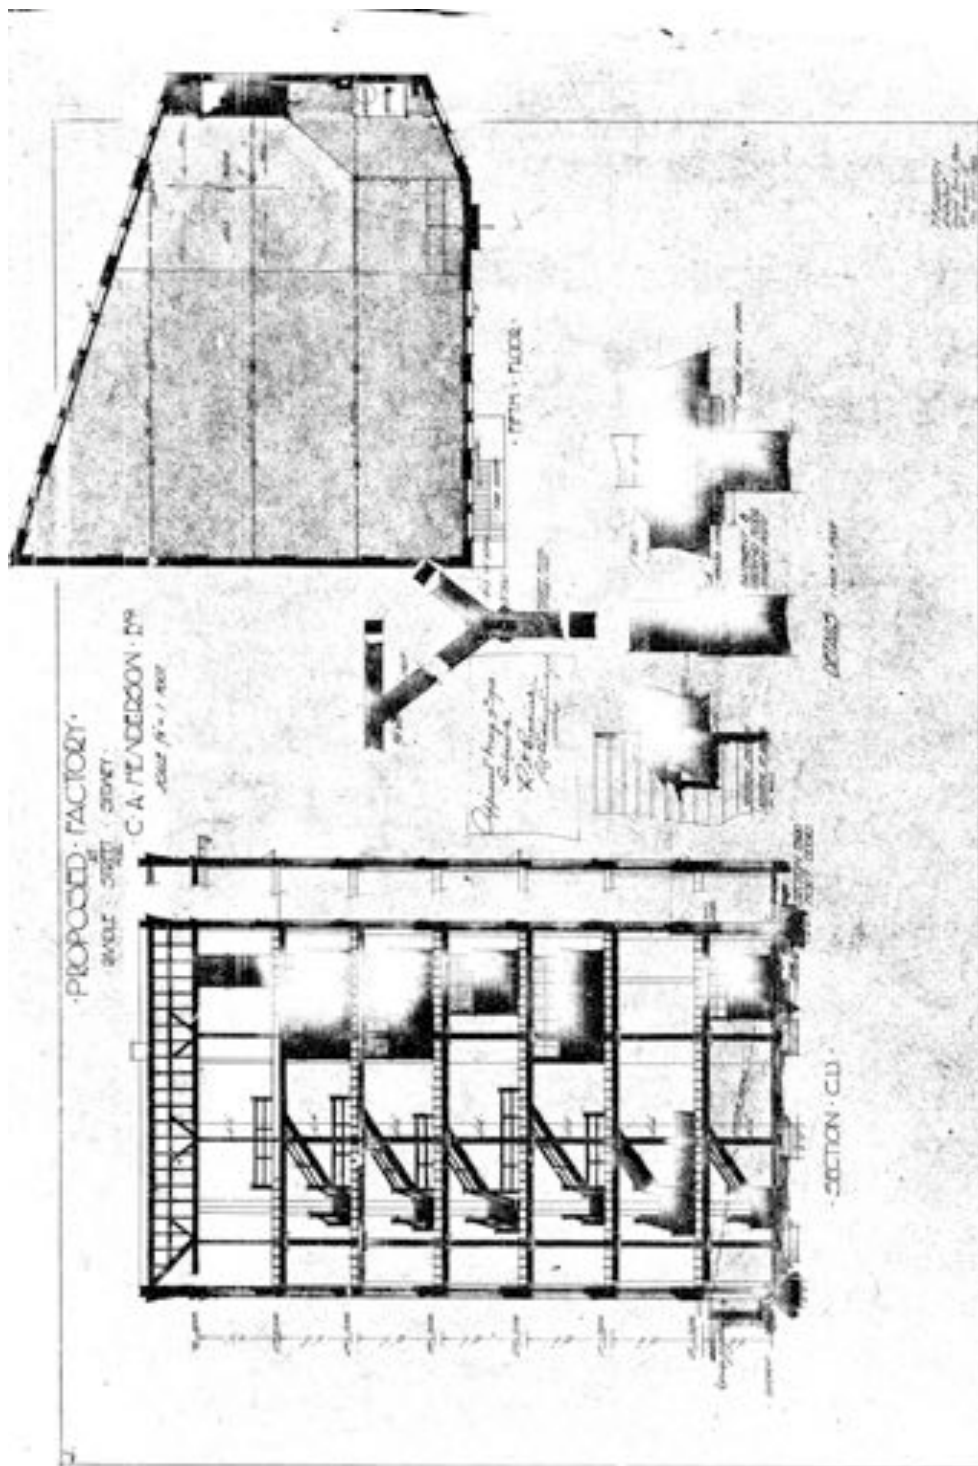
Plans of the fifth floor and section of the factory as designed in 1912 (architect TP Sampson) for RC Henderson's hat factory. The top floor housed the boiler room for the steam pressure moulding equipment
